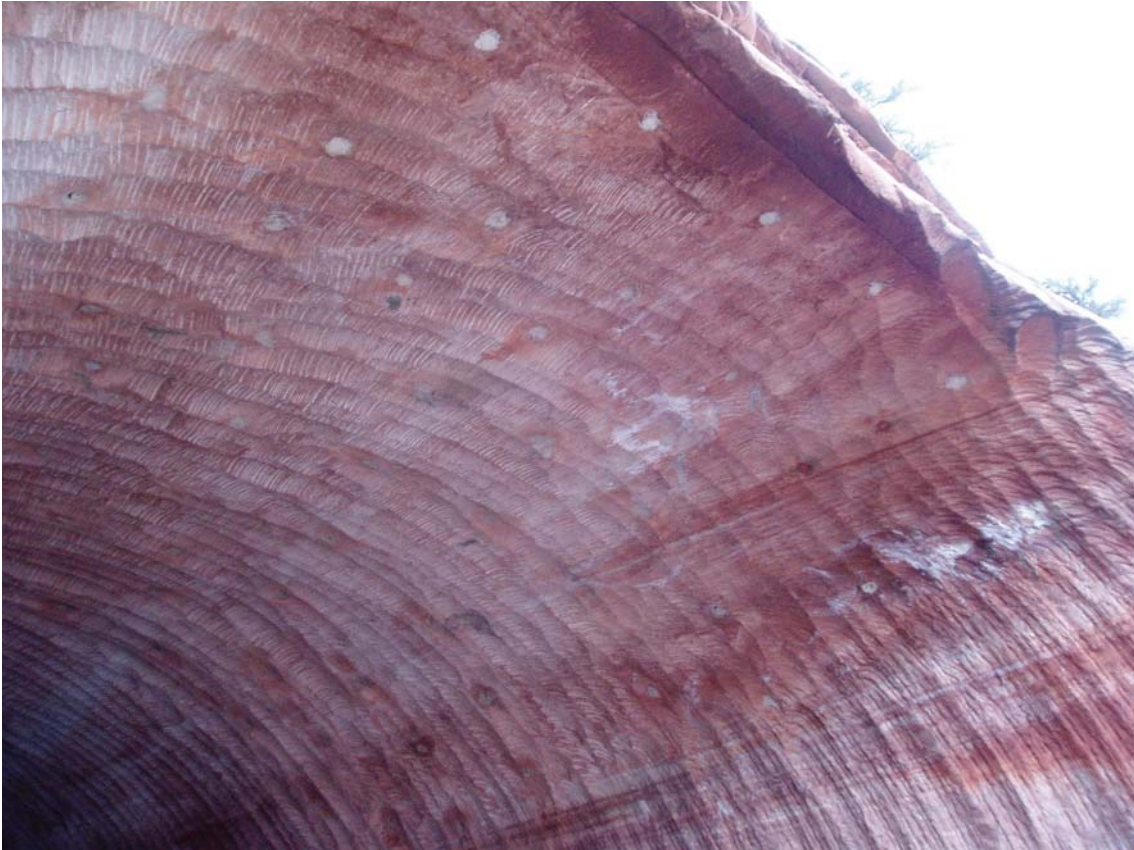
Photo. Tunnel crest supported with dowels that have been covered with colored grout.
